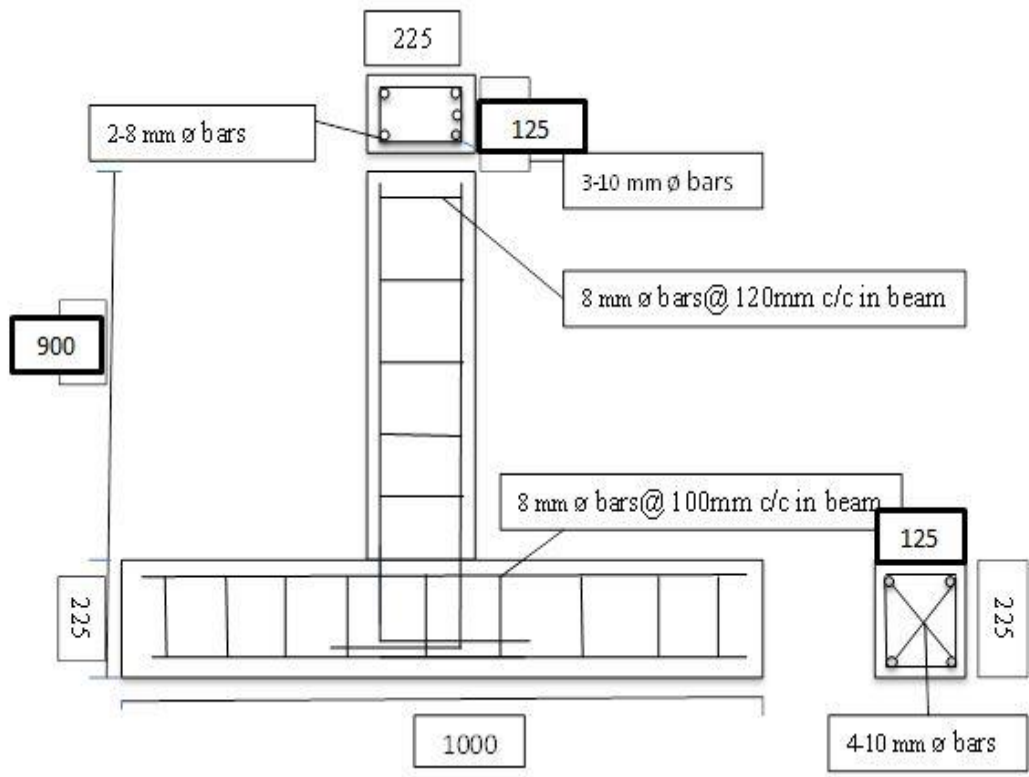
Schematic Illustration of RC Beam Column Joint
